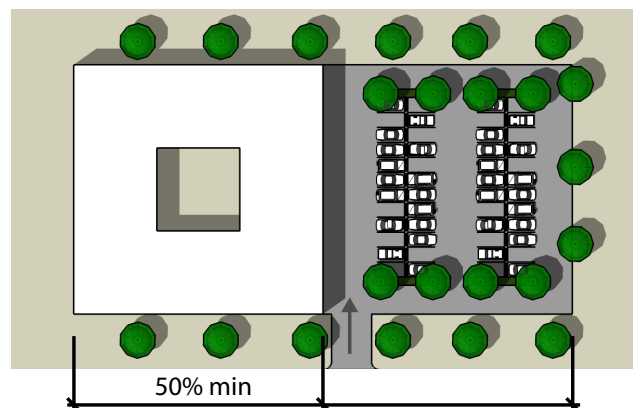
d.1.a.ii. Minimum street frontage for buildings without a central courtyard.
